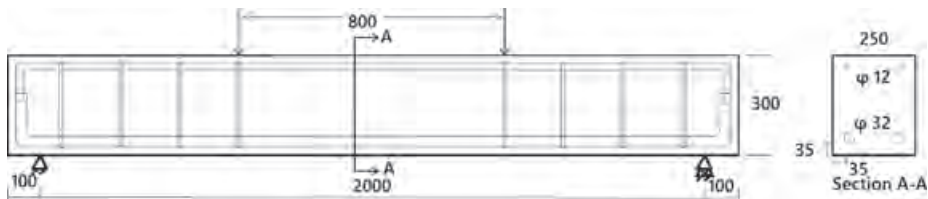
Details of bending specimens (all dimensions are in mm)
